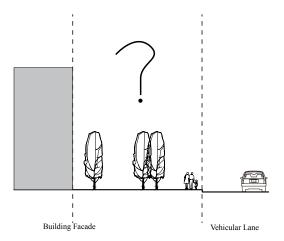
The street-facades section The space between the line of building facades along a street and the zone of vehicular traffic.
